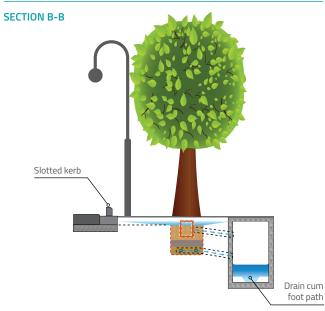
Plan & sections of bioretention basin application in a roadside verge.
